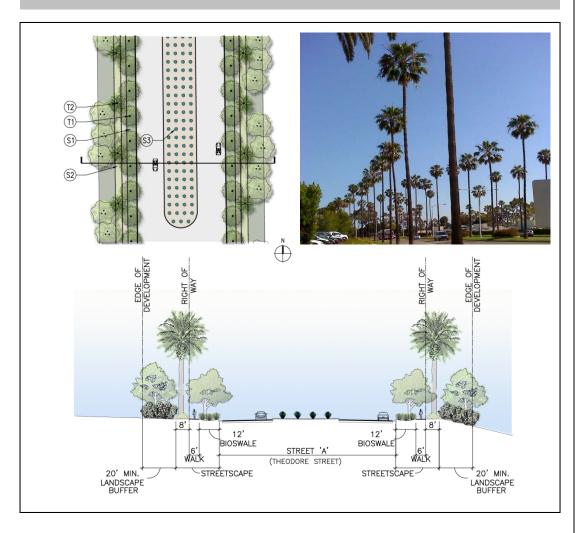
Streetscape Planting Map (see pages 4-38 to 4-42)
